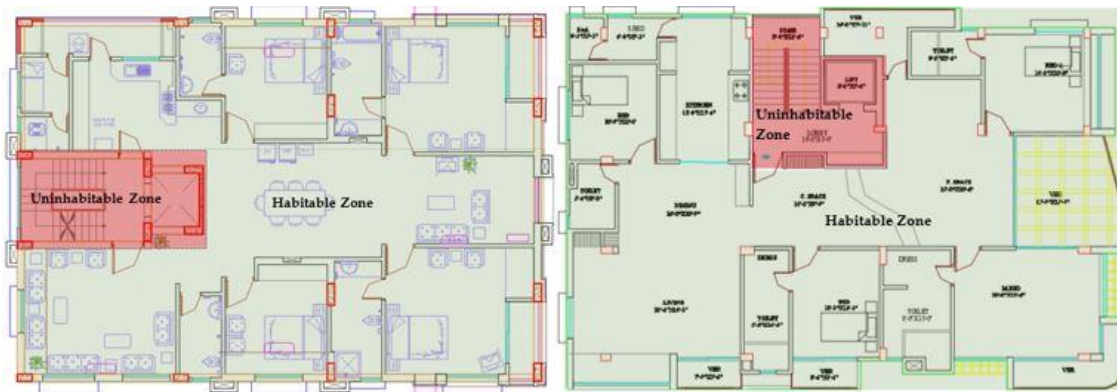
Typical Floor Plans for Single-unit Apartments. Source: Field Study
